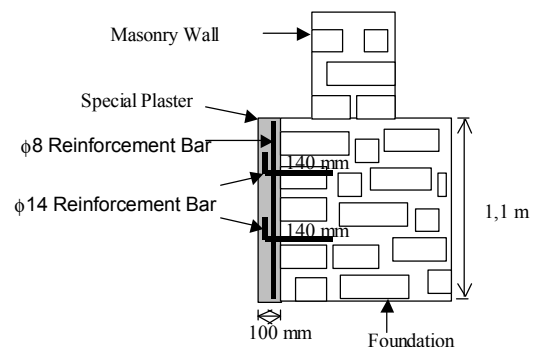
Special Plaster Mesh Steel Reinforced that is proposed for building foundation implementation
